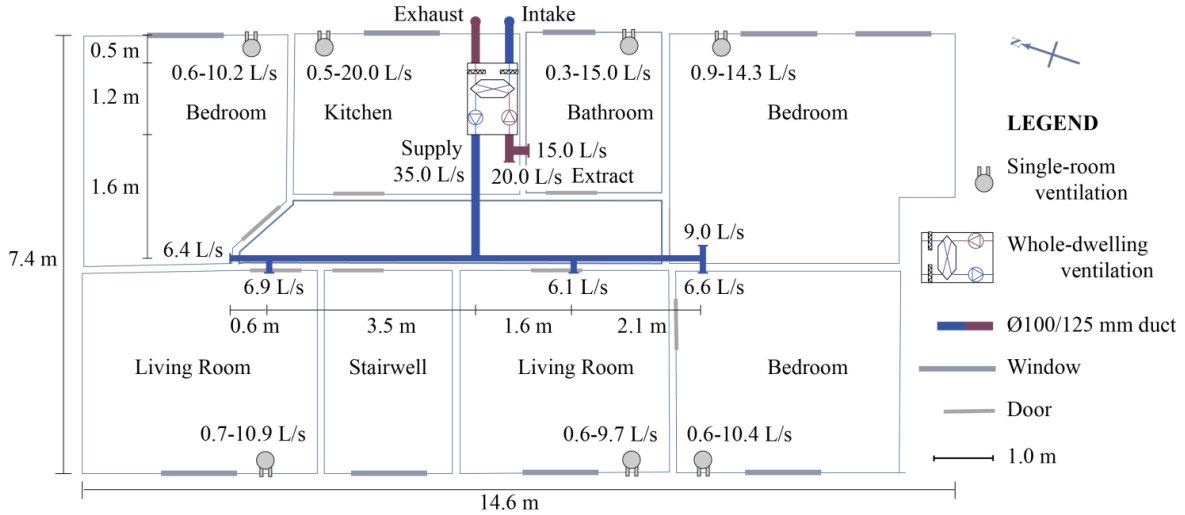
Floorplan of a renovated apartment with locations and airflows of the proposed ventilation systems.
